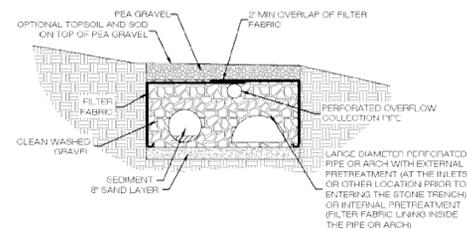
A: Infiltration Section with Supplemental Pipe Storage
